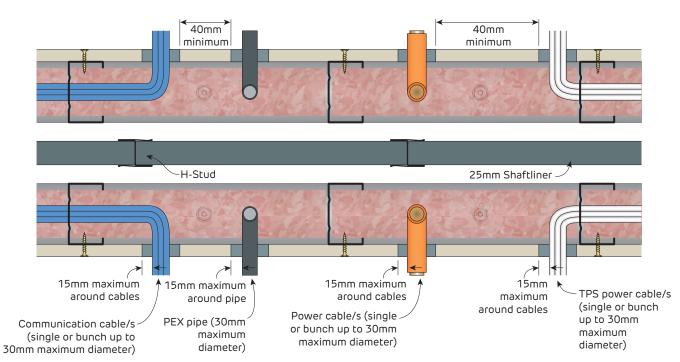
Plumbing and Electrical Penetrations in Wall Linings Plan
